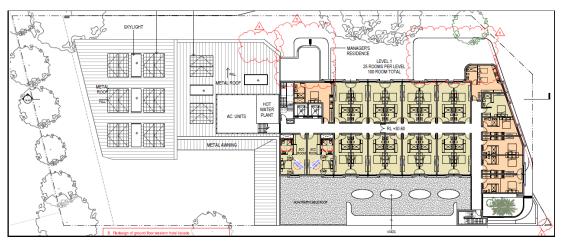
Proposed hotel level 1 and warehouse roof plan (DA-101, Issue E)
